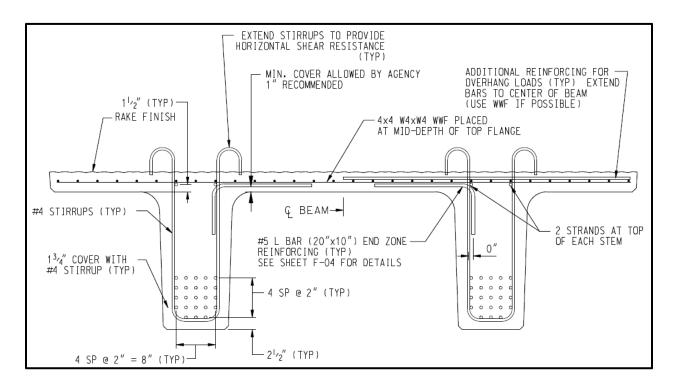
Detail of NEXT Partial-Depth Section Prior to Topping
